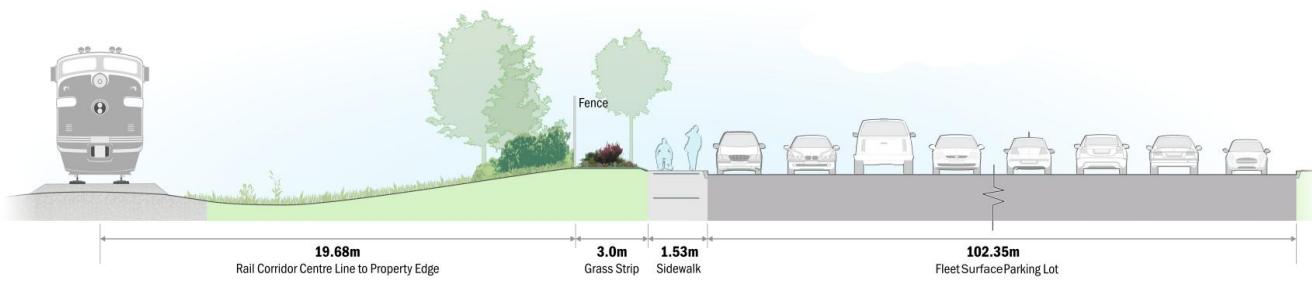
Development Cross-Section of the Proposed Storage Area (Parsons, 2025).
